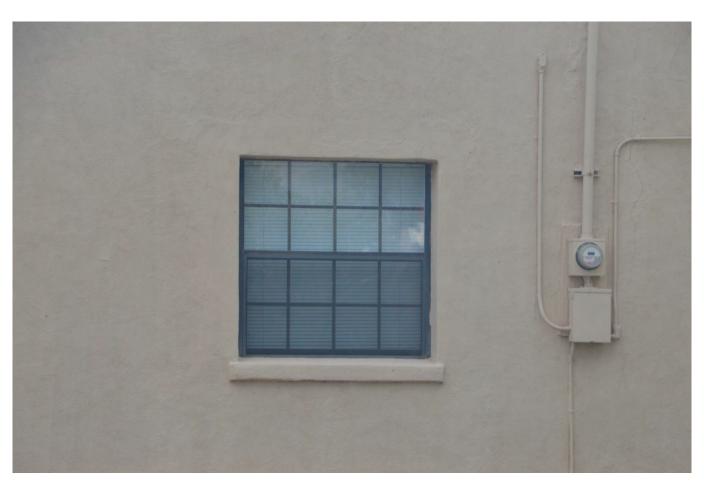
PHOTOS OF EXISTING STRUCTURE SHOWING SOME OF THE WINDOWS TO BE REPLACED
